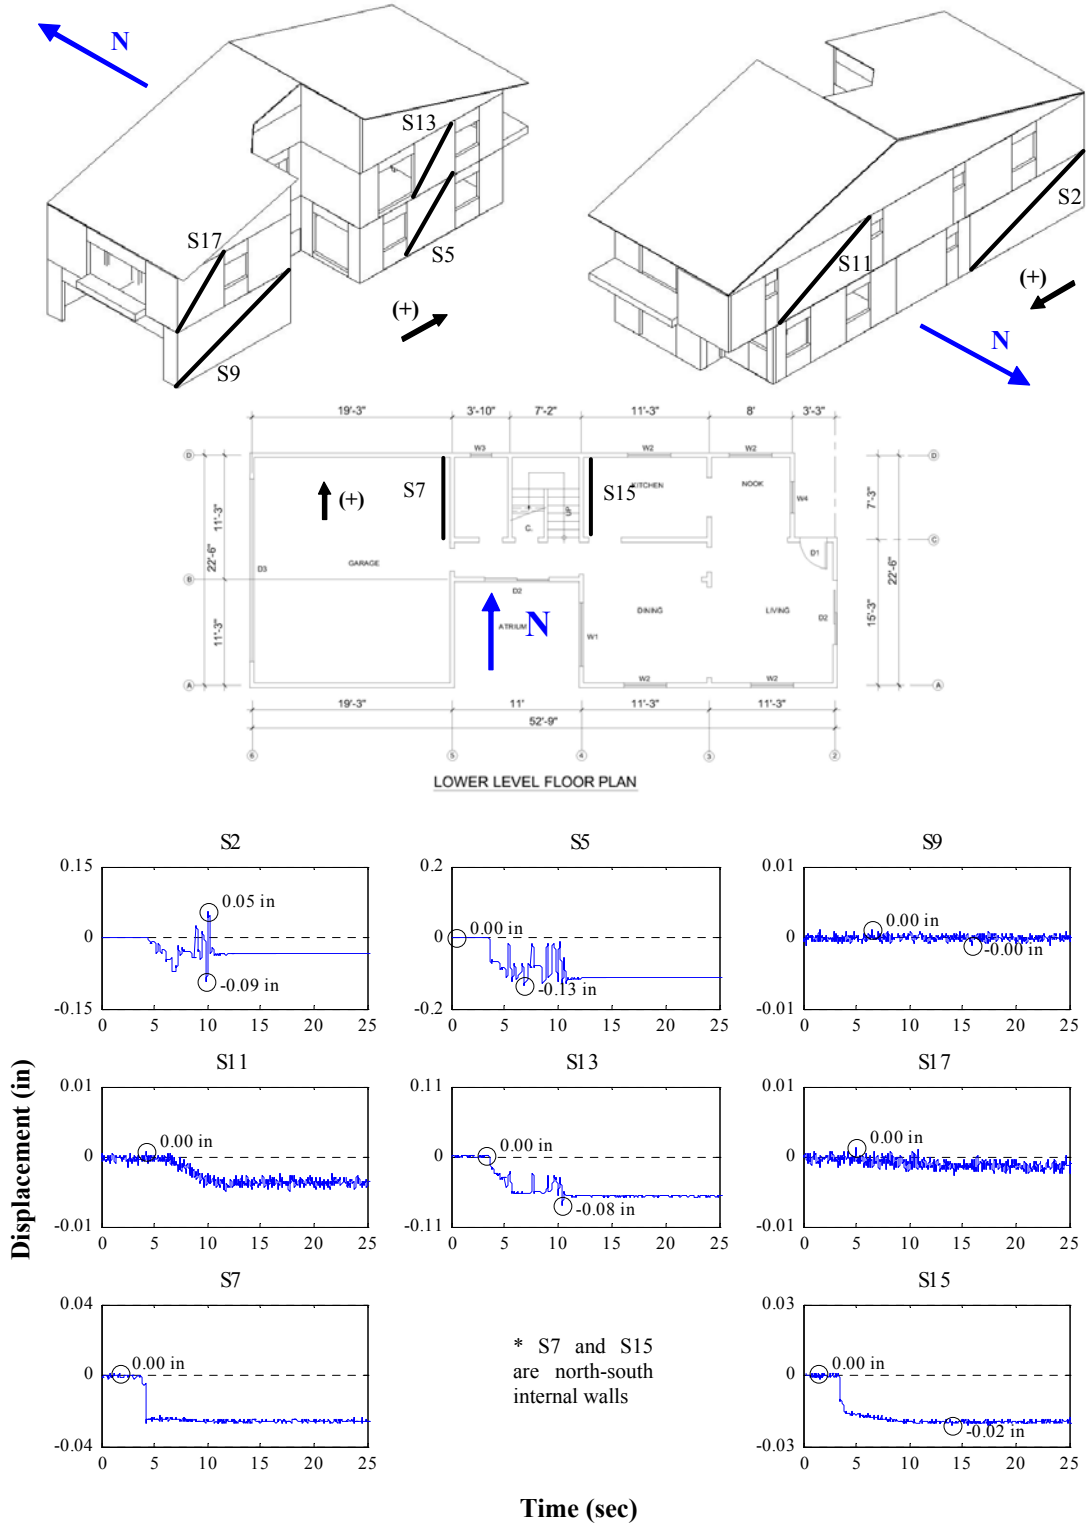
Wall deformations of east-west internal walls for Test NWP2S03
